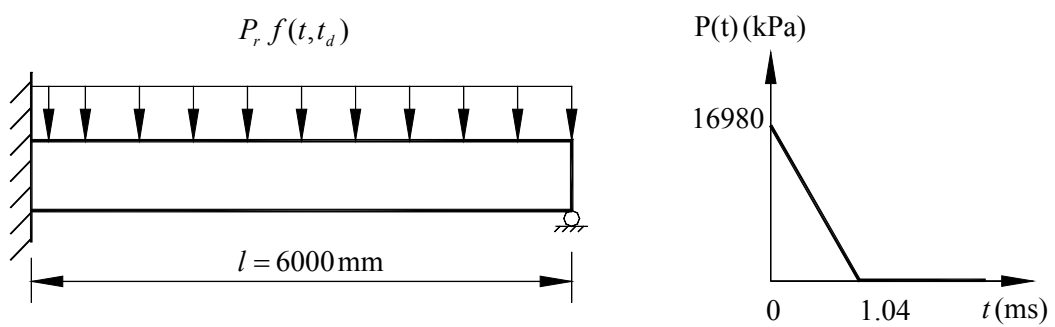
A fixed/roller-supported beam under the blast loading
